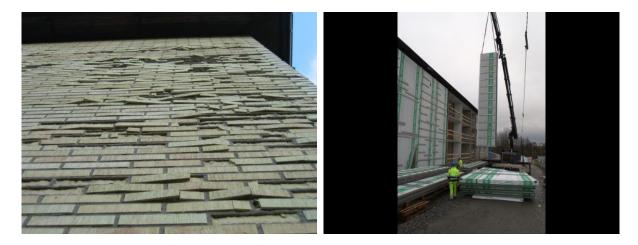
Brick wall at Brogården in Allingsås before the renovation, and as new insulation elements were mounted Photo: Hans Eek
